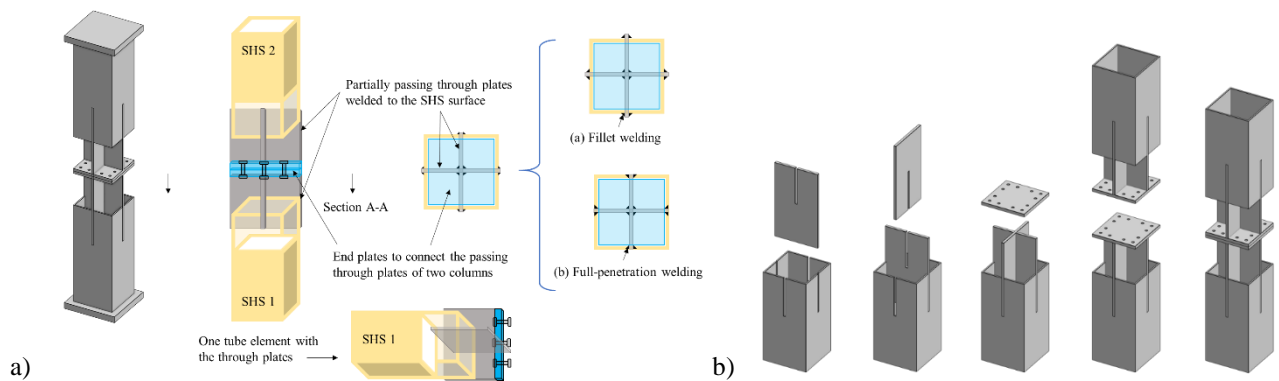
CS-3 connection: a) Schematic diagram; b) step-by-step assembly
